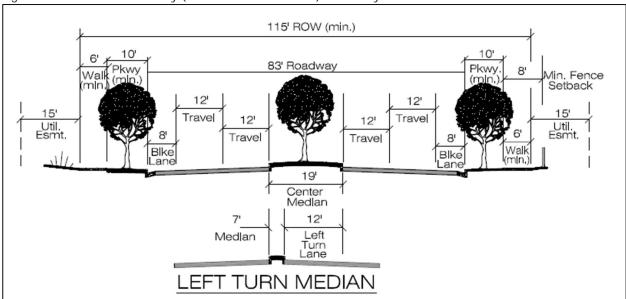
East Vine and Lemay (4-Lane Arterial Street) Roadway Cross Section
